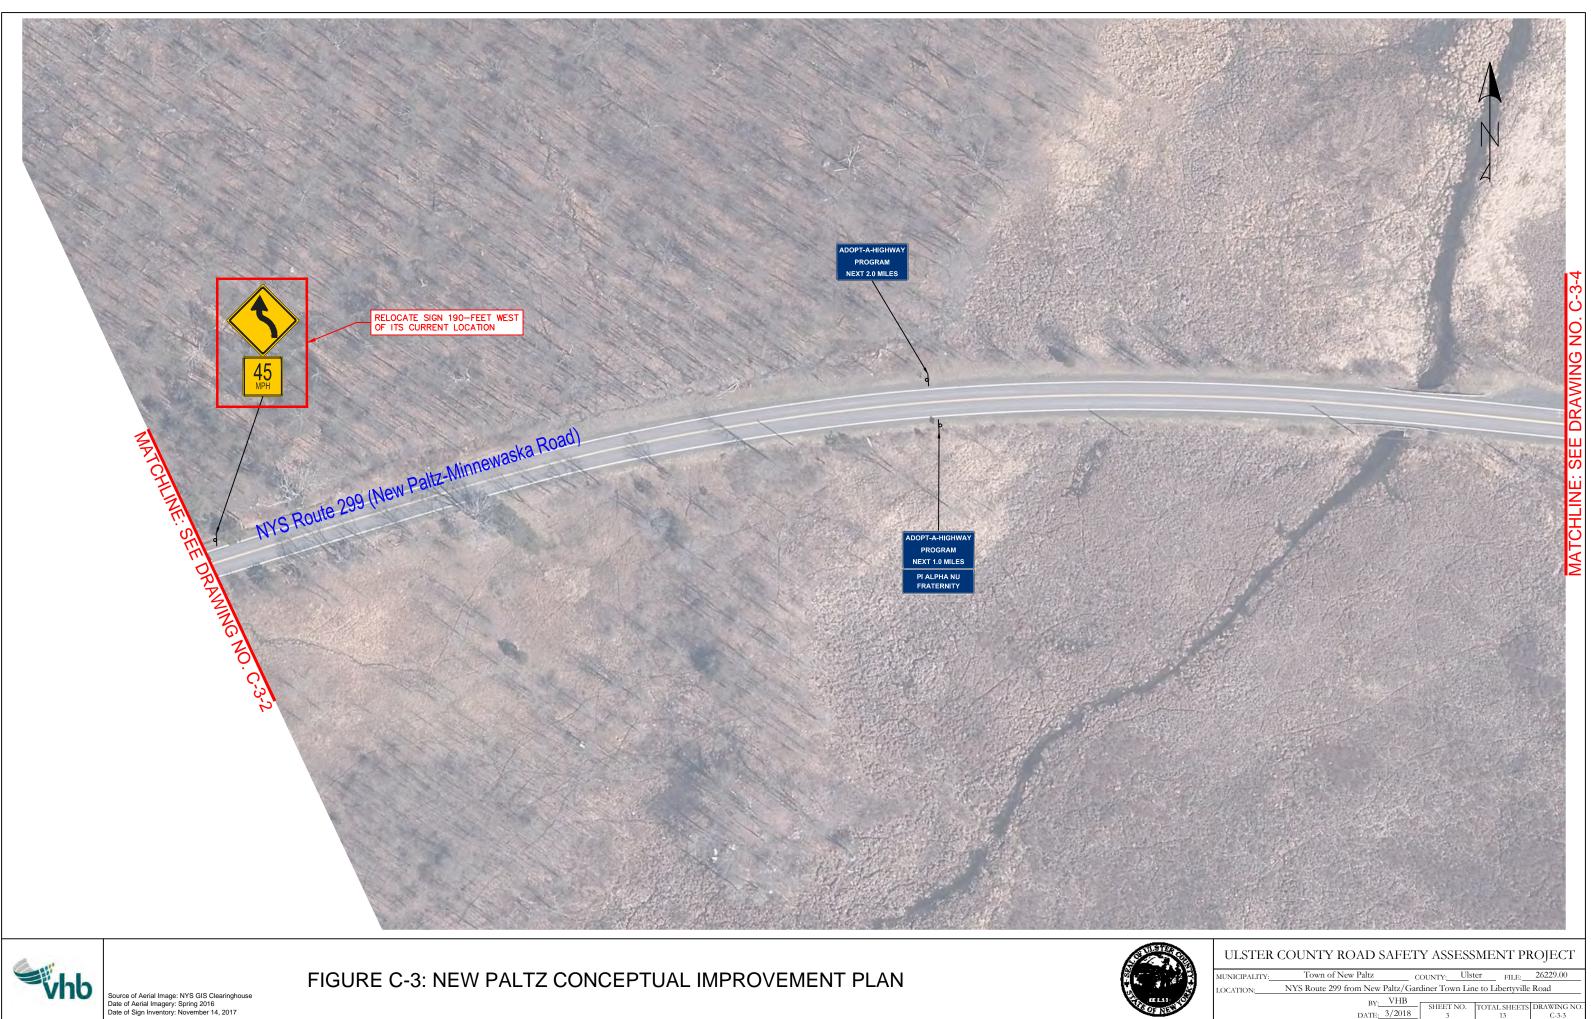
NEW PALTZ CONCEPTUAL IMPROVEMENT PLAN
